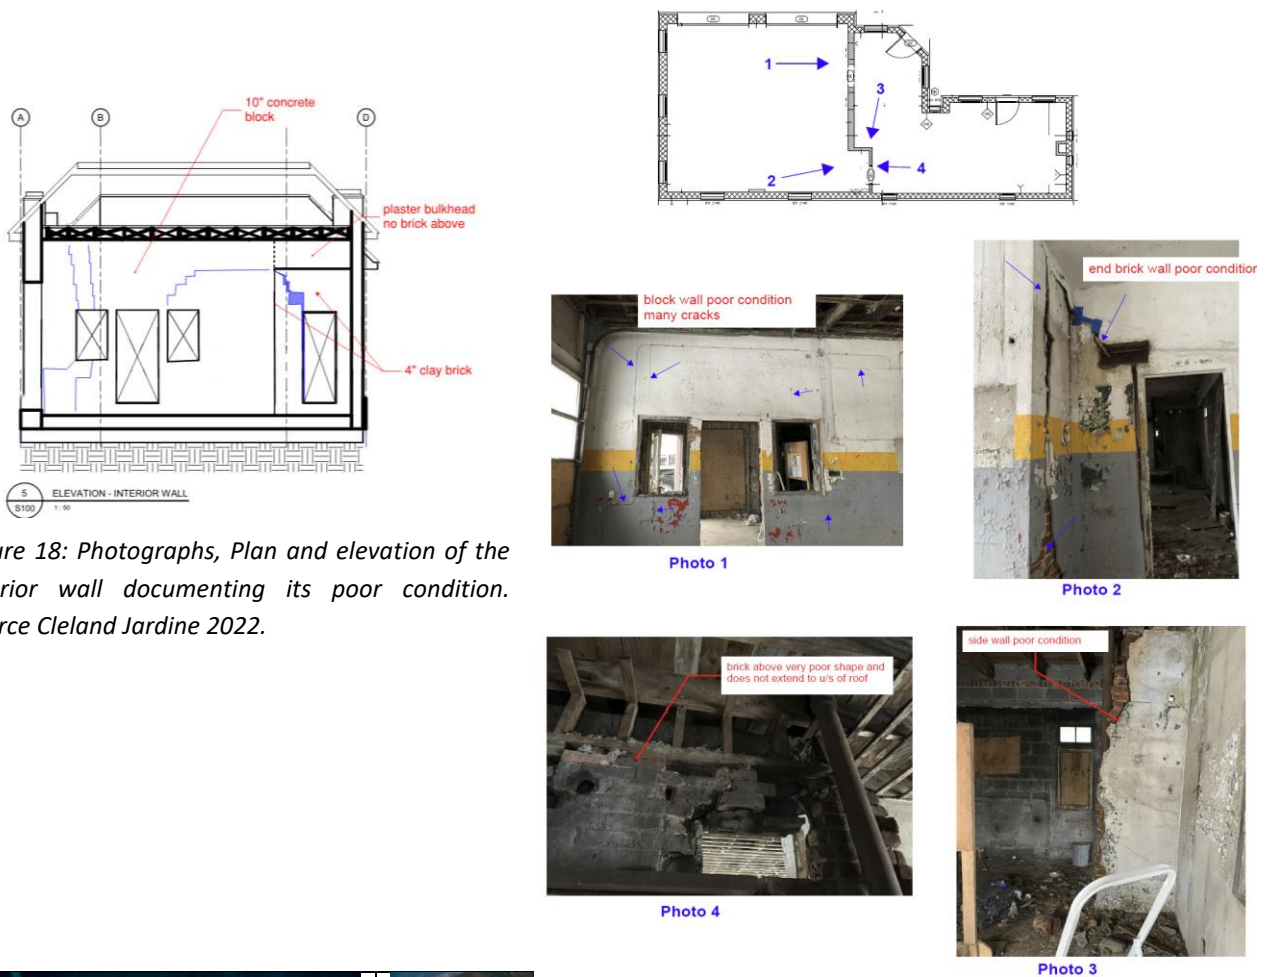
Photographs, Plan and elevation of the interior wall documenting its poor condition. Source Cleland Jardine 2022.
